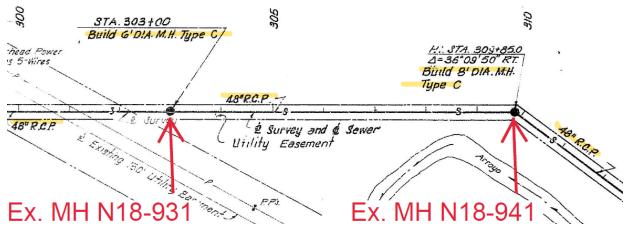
1967 Record Drawings of interceptor sewer pipe installation
